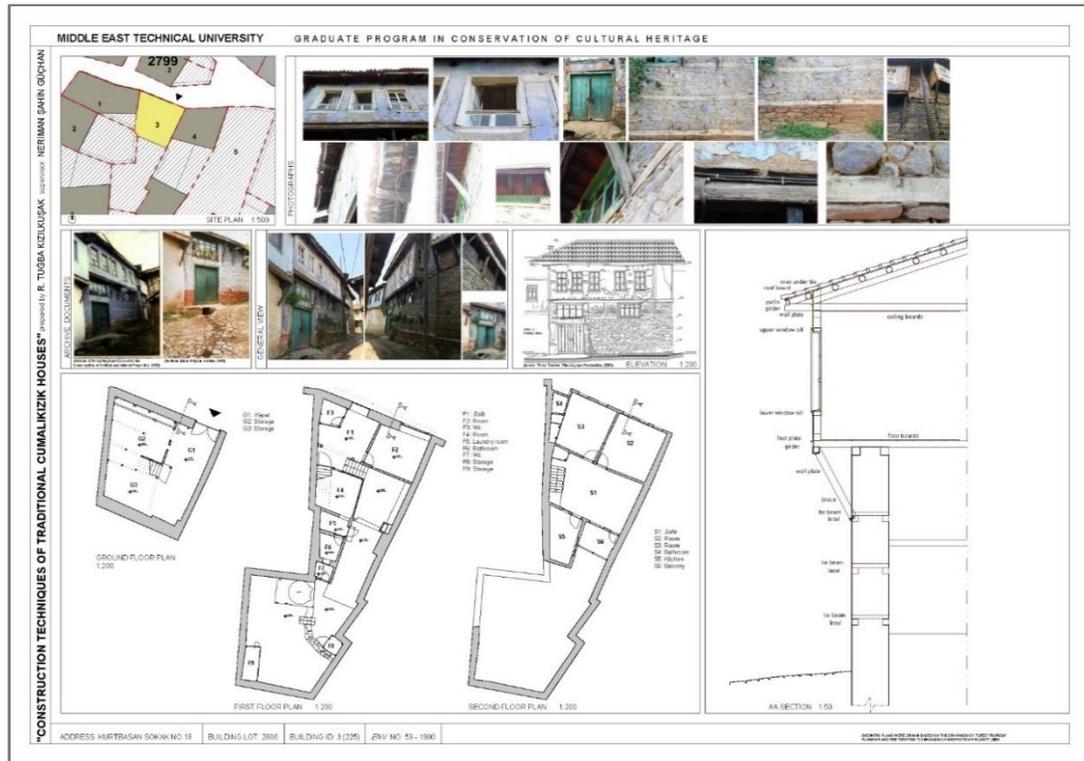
Second stage: information sheet prepared for Group A and Group B buildings
